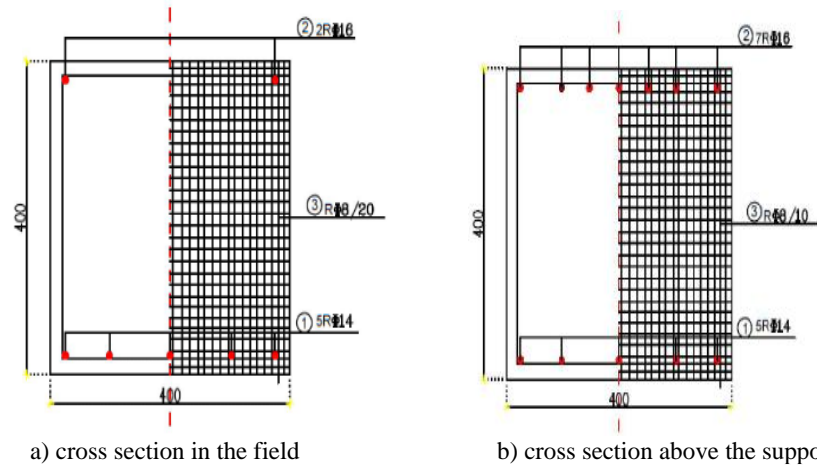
Cross section of continuous reinforced concrete beam in the middle of the span and above the support, for cross section 40x40 cm with cover thickness $a = 3$ cm
